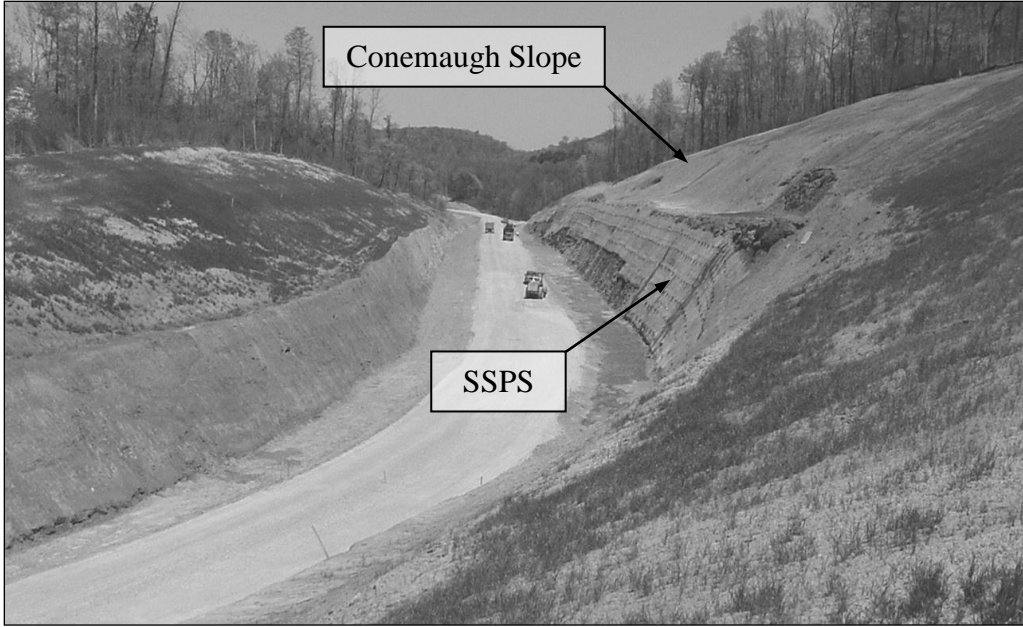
Cross Section View of Conemaugh Slope Prior to Slope Failure.
